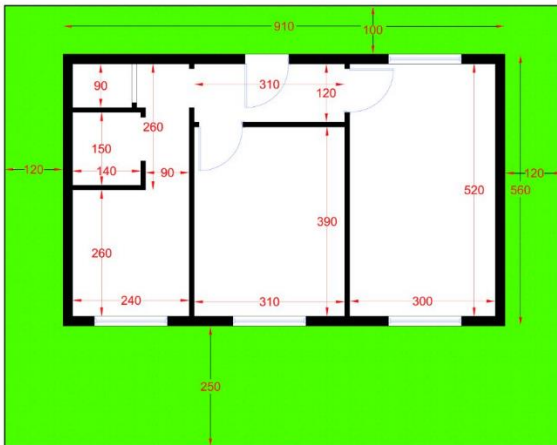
The Housing unit plan in the modular village (AMRO KATKHADA, 2021)
